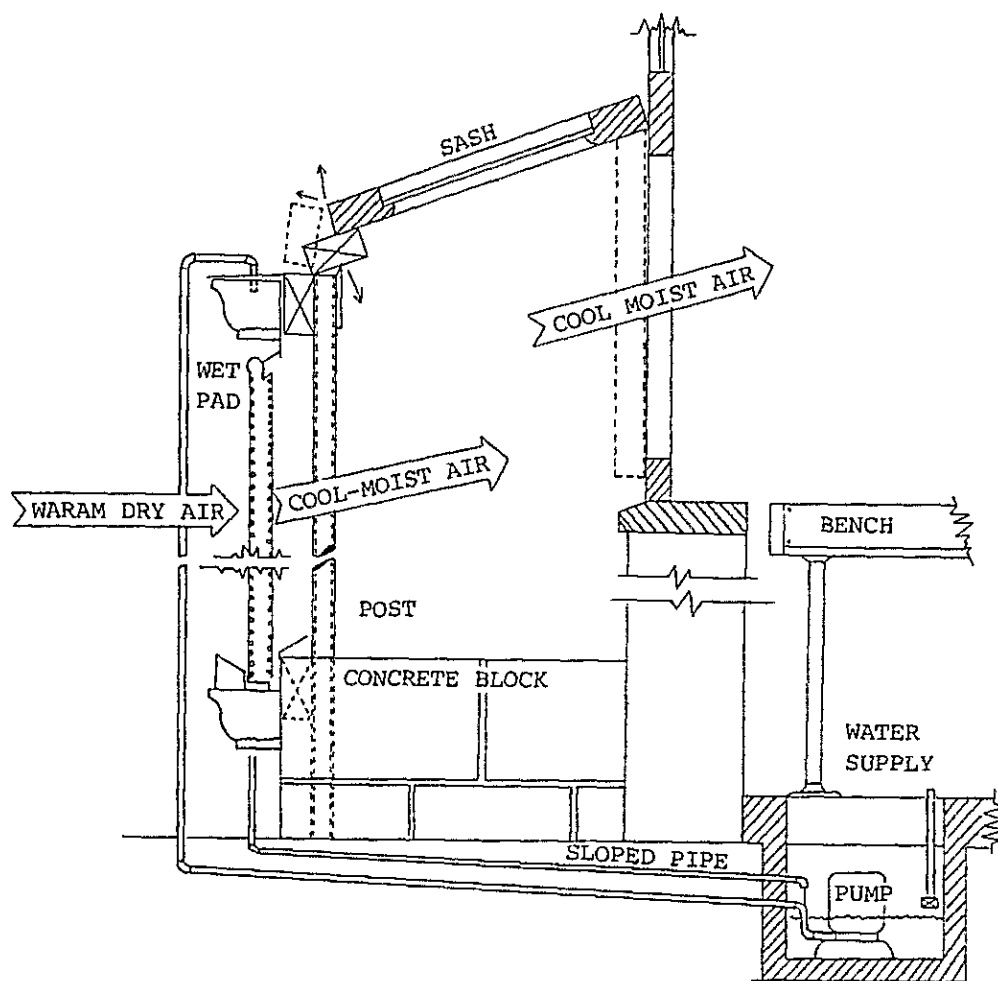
Lower sash on greenhouse wall open for wet pad cooling (Berkel, 1968)
